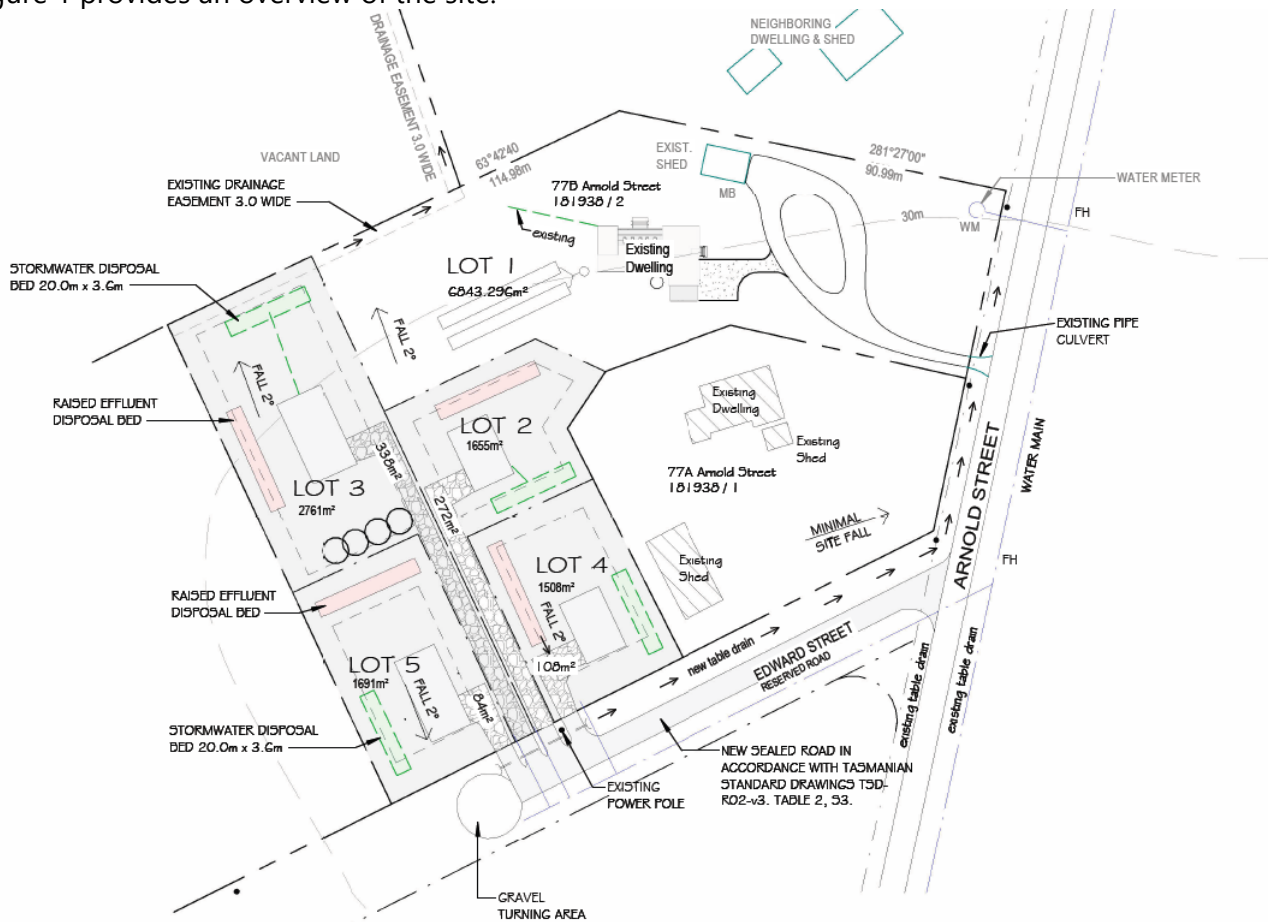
Subdivision Plan (from MDC Design and Drafting drawing 2400WD02)
